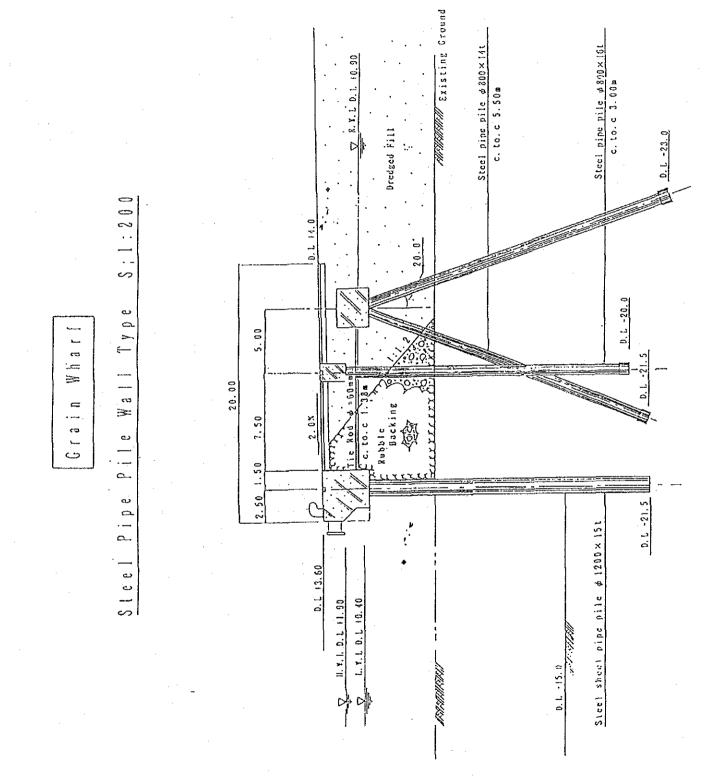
Steel Pipe Pile Wall Type for Grain Quaywall
